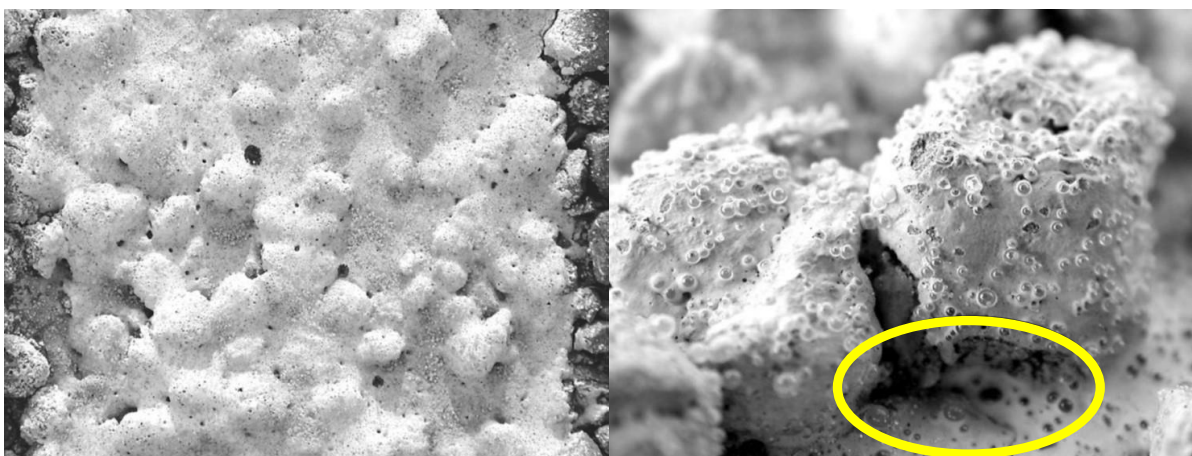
Typical TRM on new surface dressing (left). Glass beads and binder falling in between aggregates (right).
